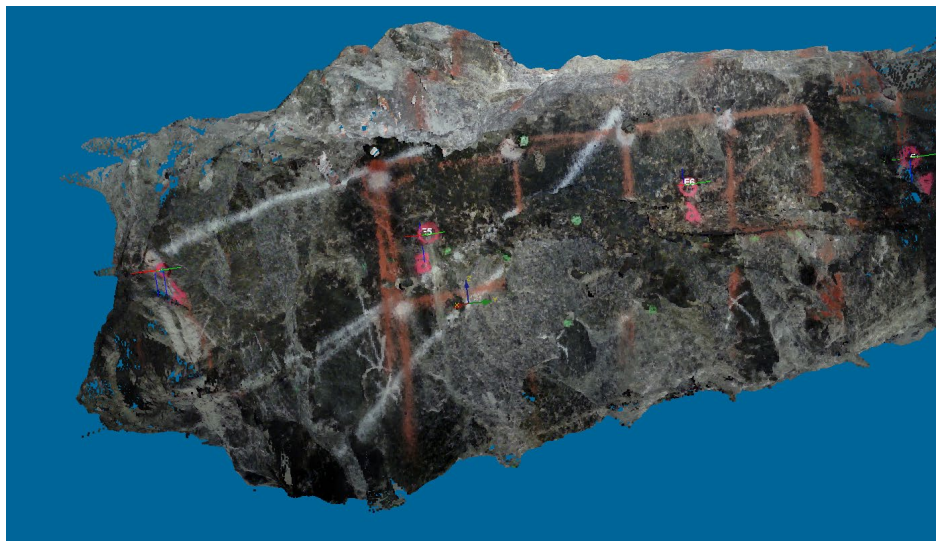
Cross-sectional view with geology and blast damage.
